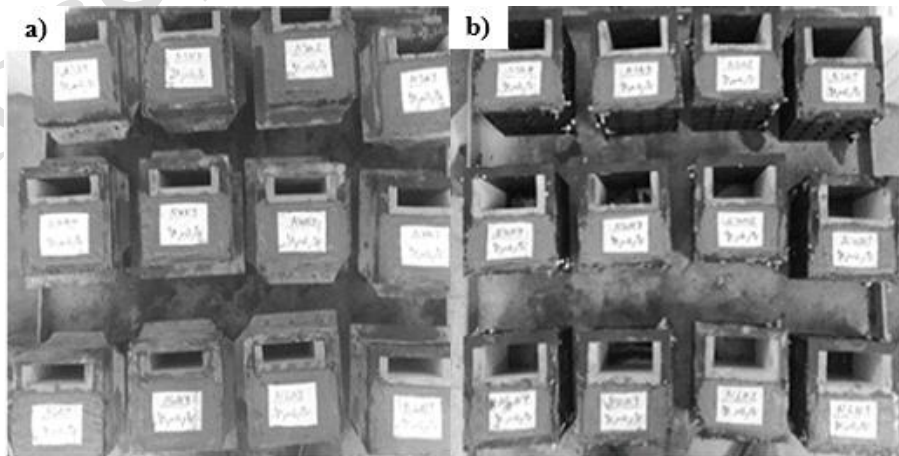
(a) Tensile splitting samples; (b) bi-surface shear specimens.
